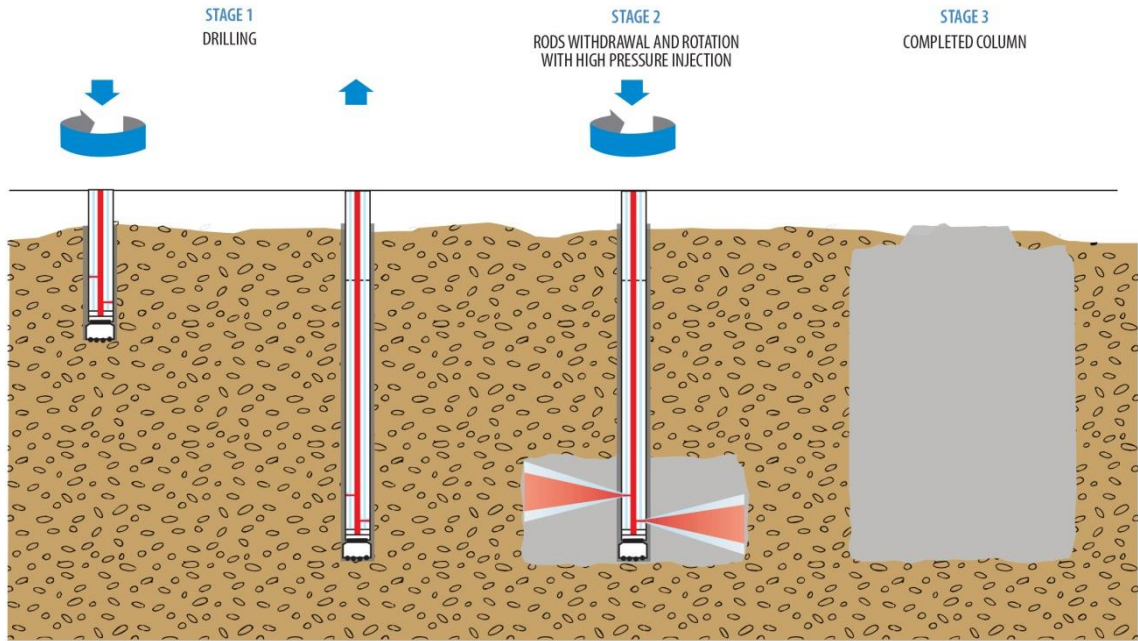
Jet grouting method (Source: Croce et al. 2014).
